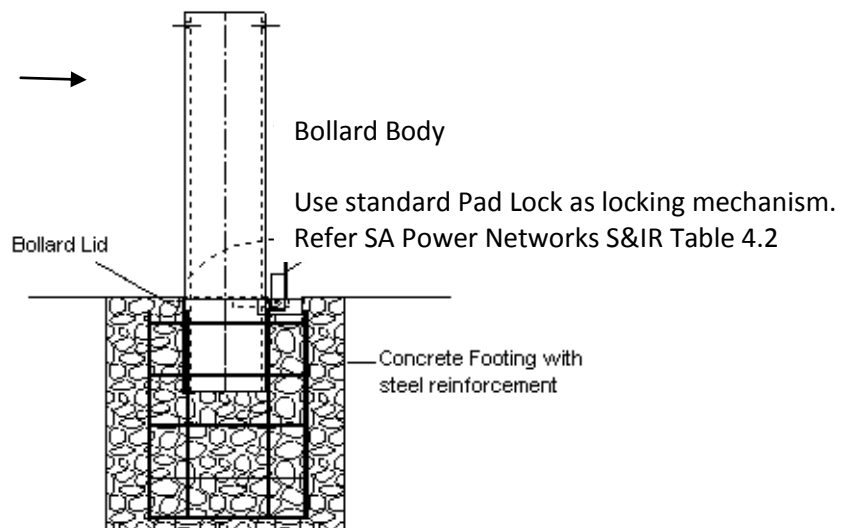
TYPICAL REMOVABLE BOLLARD
